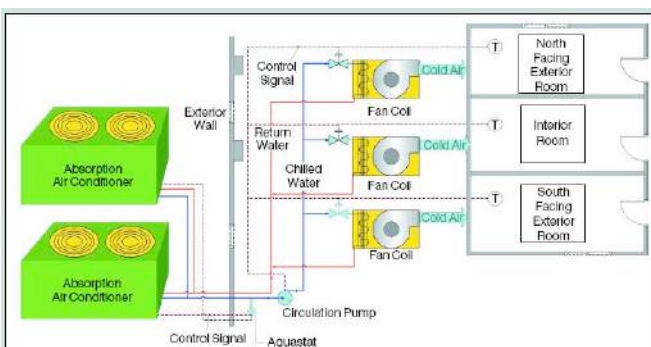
Typical layout for a gas air conditioner in a zoned system.
